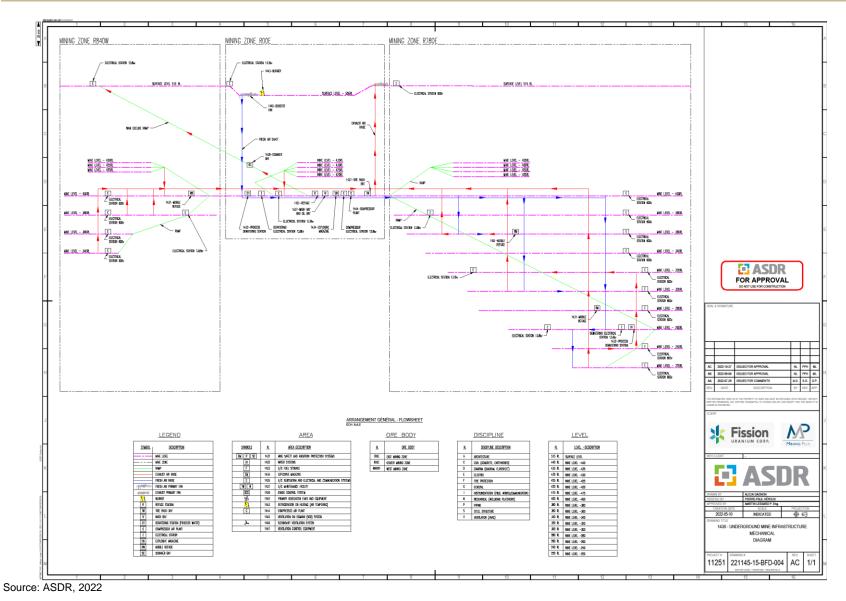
PLS Underground Mine Infrastructure Schematic
